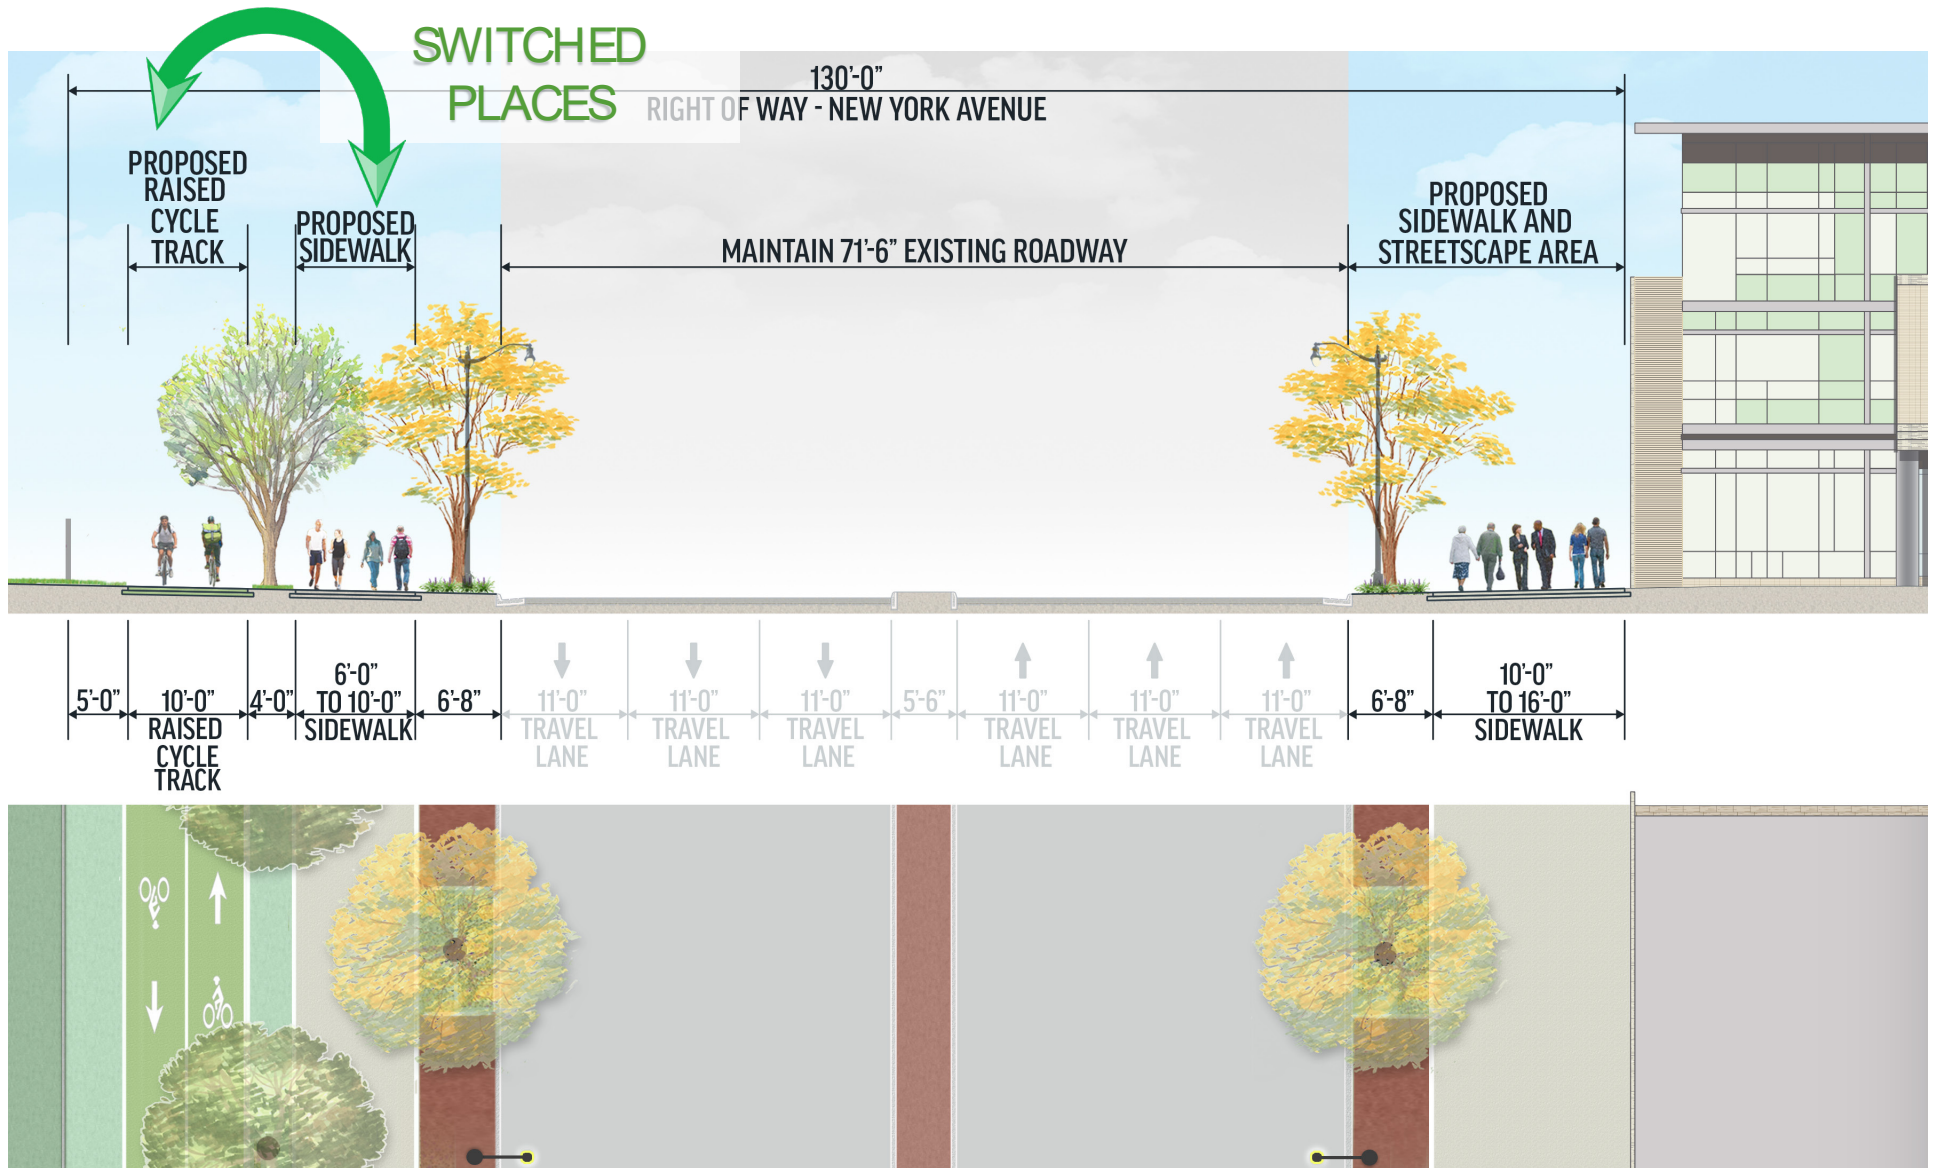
The major change in the preferred concept design from Public Meeting #3 to Public Meeting #4 was switching the locations of the north side cycle track and sidewalk.
